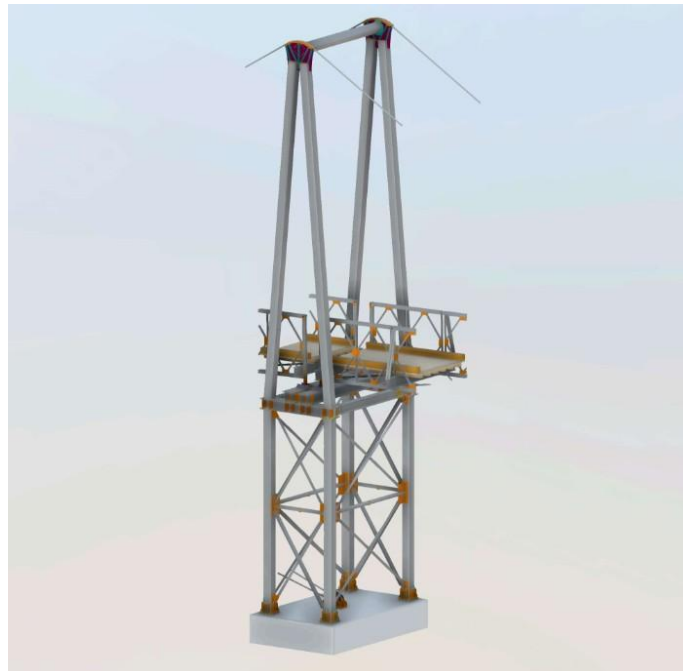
Rendered view of the A-frame tower pylon showing the HSS column legs, transverse crossbeam, diagonal bracing, and curved cable saddle at the tower head.
